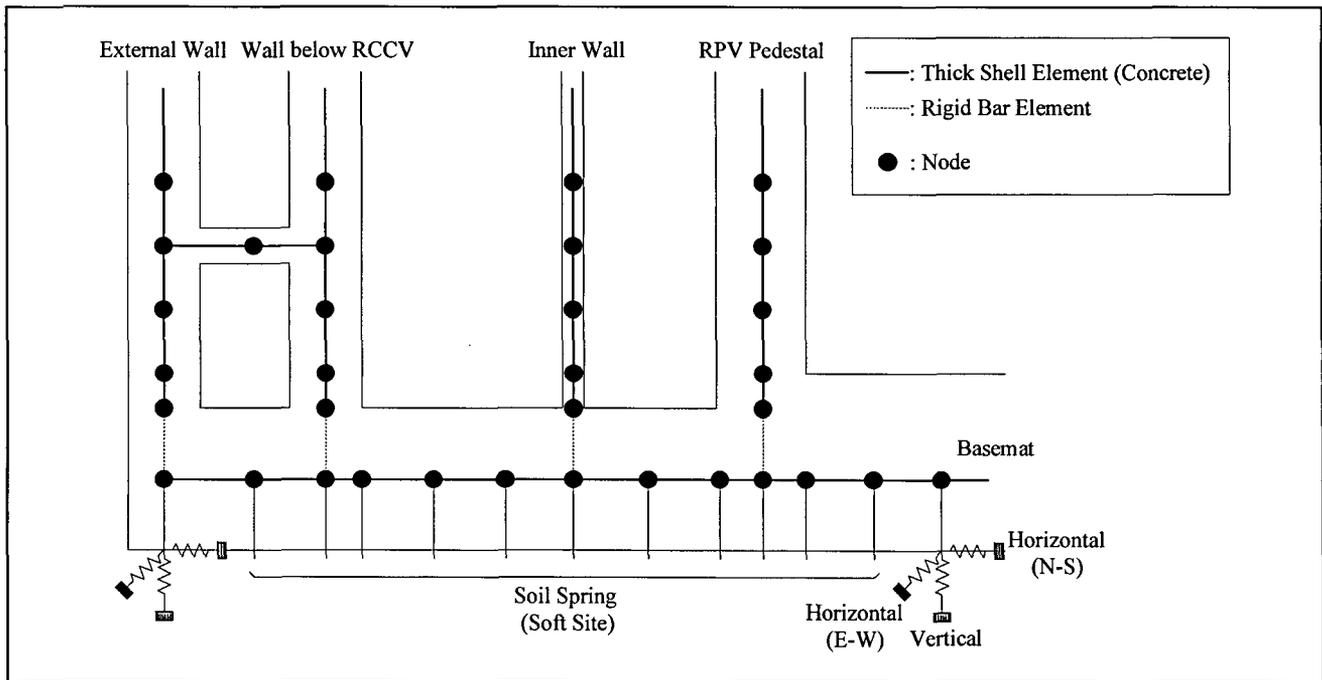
(1) Details of the Basemat Portion of the NASTRAN Model
